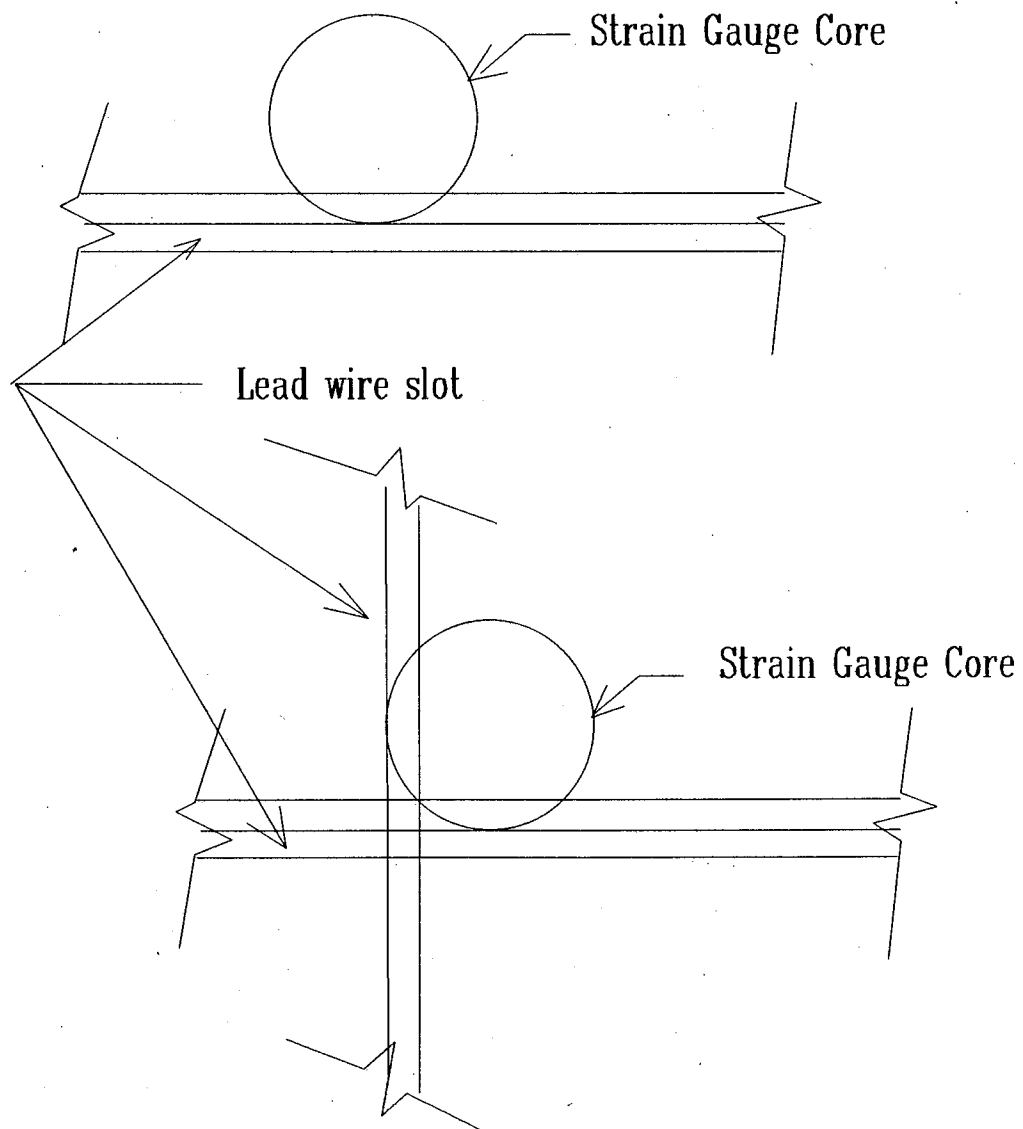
Plan View of Lead Wire Slots Bisecting Core Holes
